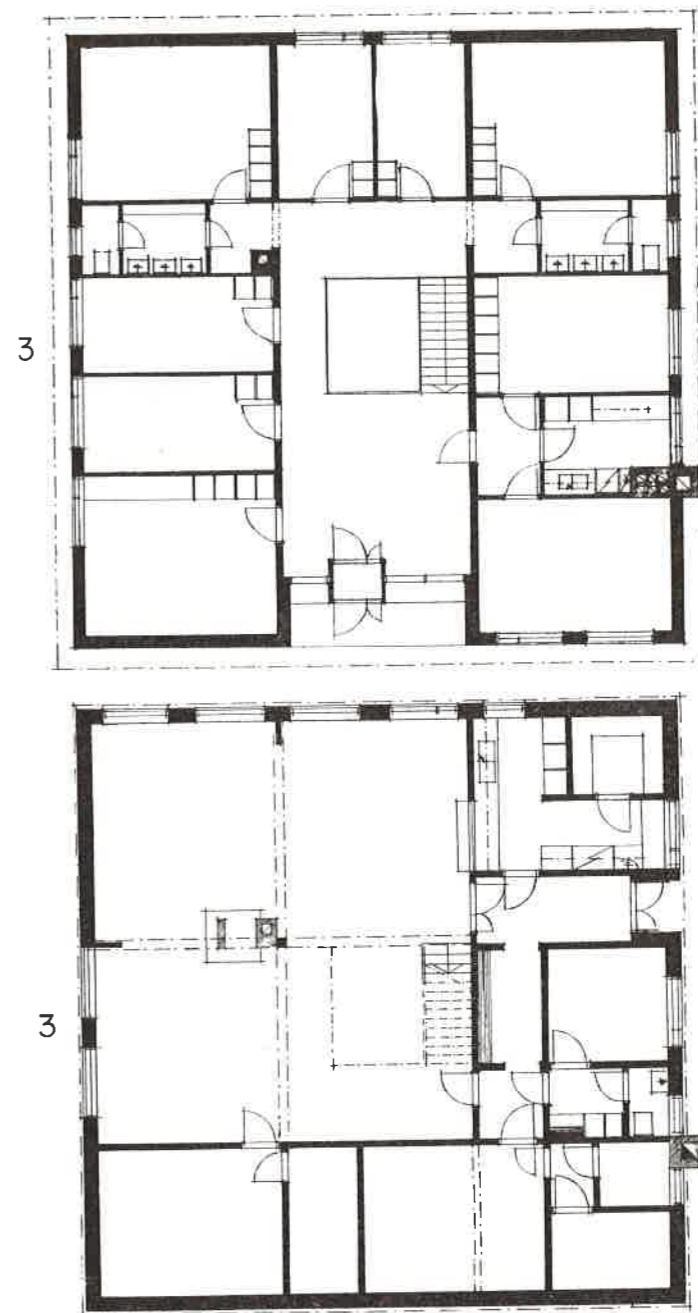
Ground plan of building 3. — Upper plan: first floor with 7 rooms for research workers and the apartment of the superintendent of the station. — Lower plan: the ground floor with lecture and dining room, library, laboratories (lower row) and kitchen (in the upper right corner). Scale 1:180.
